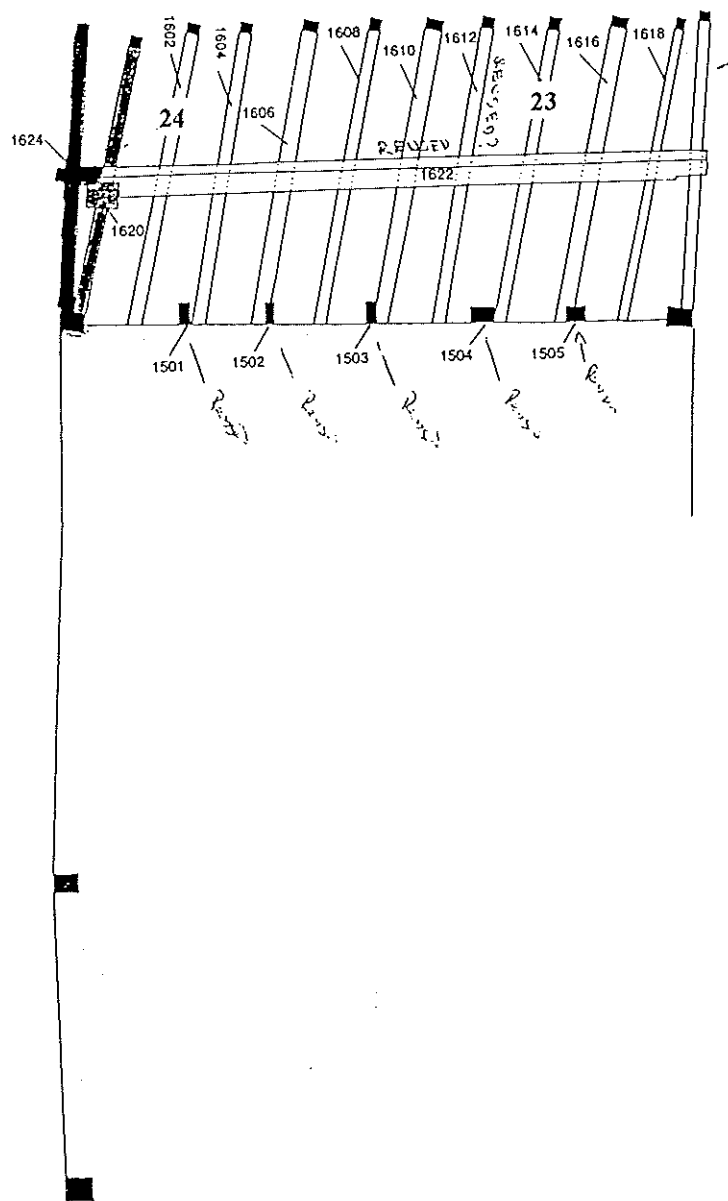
Hall truss (viewed from the north) to show timbers sampled
